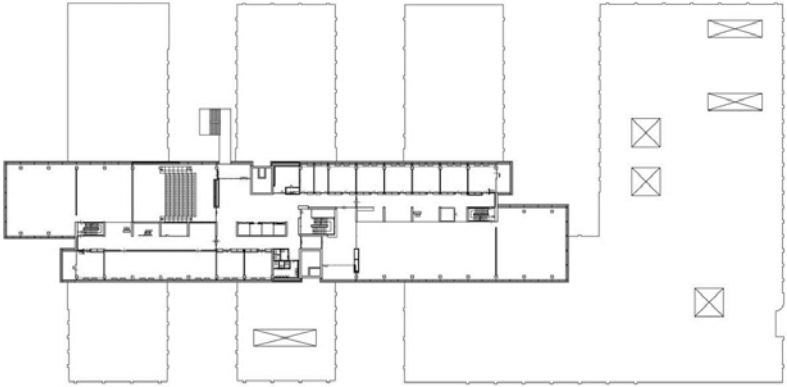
Floor plan 2nd floor with contour of ground floor and 1st floor
